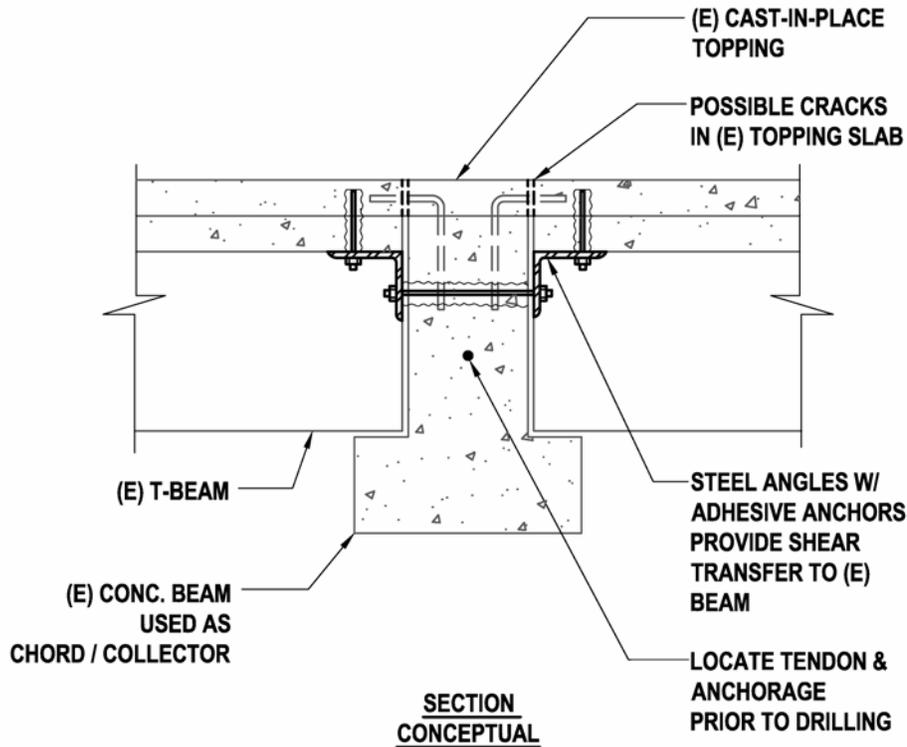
Added or Enhanced Chord or Collector at Floor Interior with Cast-In-Place Topping Slab
